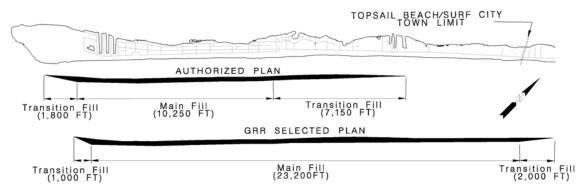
Authorized Plan (HD 393/102/2) and GRR Selected Plan, Plan view
